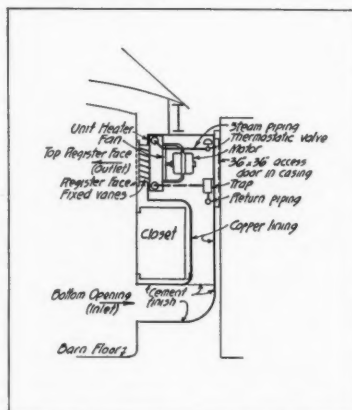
TYPICAL DETAIL OF UNIT HEATERS IN COW BARN
